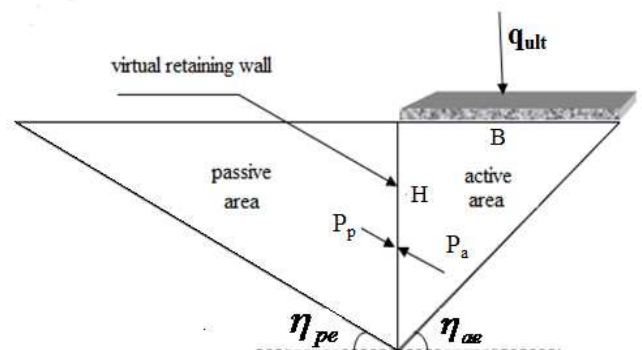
Failure surface of soil beneath the strip footing with virtual retaining wall method
